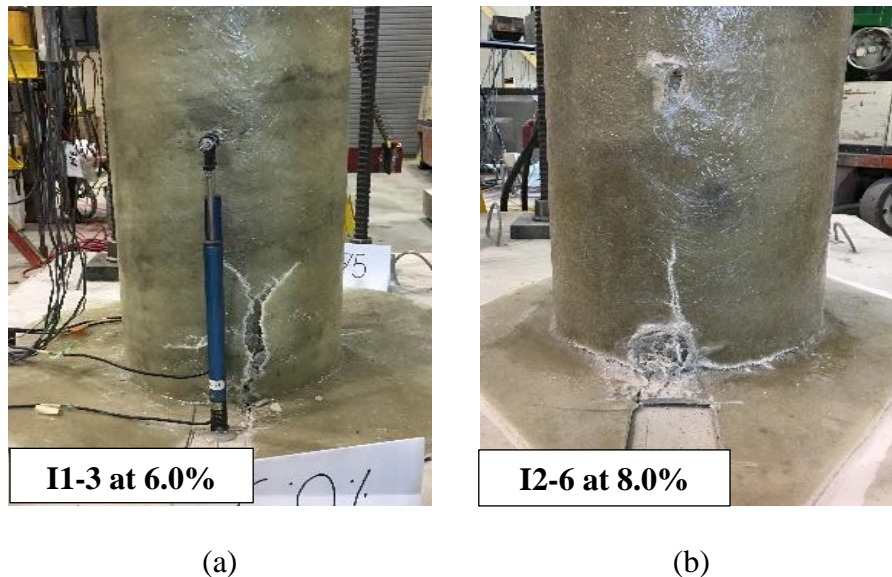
Failure mode of specimen (a) I1-3 (b) I2-6
